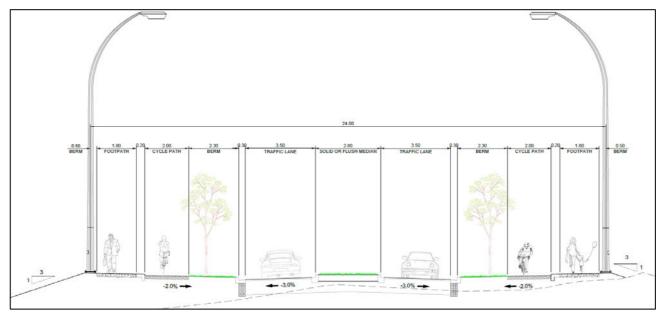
Typical Cross Section for Ponga Road included within the Drury Arterial Network DBC
